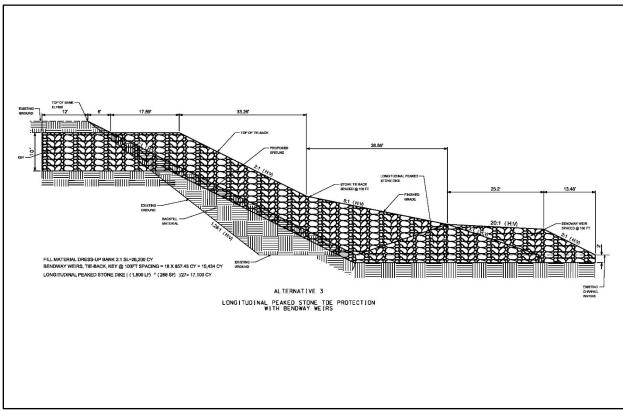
Alternative 3–Longitudinal Peaked Stone Toe Protection with Bendway Weirs
